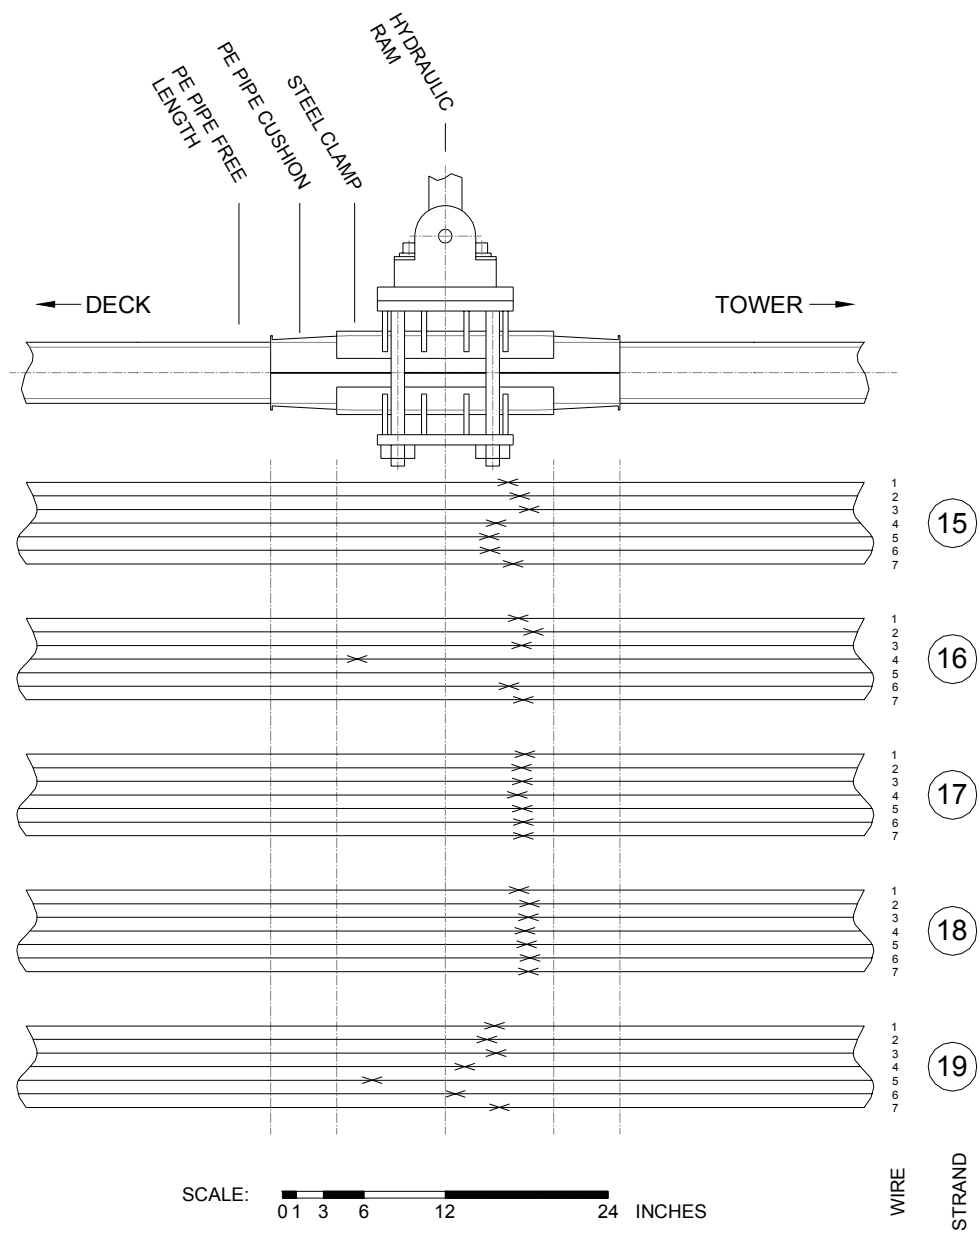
Location of wire breaks under the load point - Specimen 7
